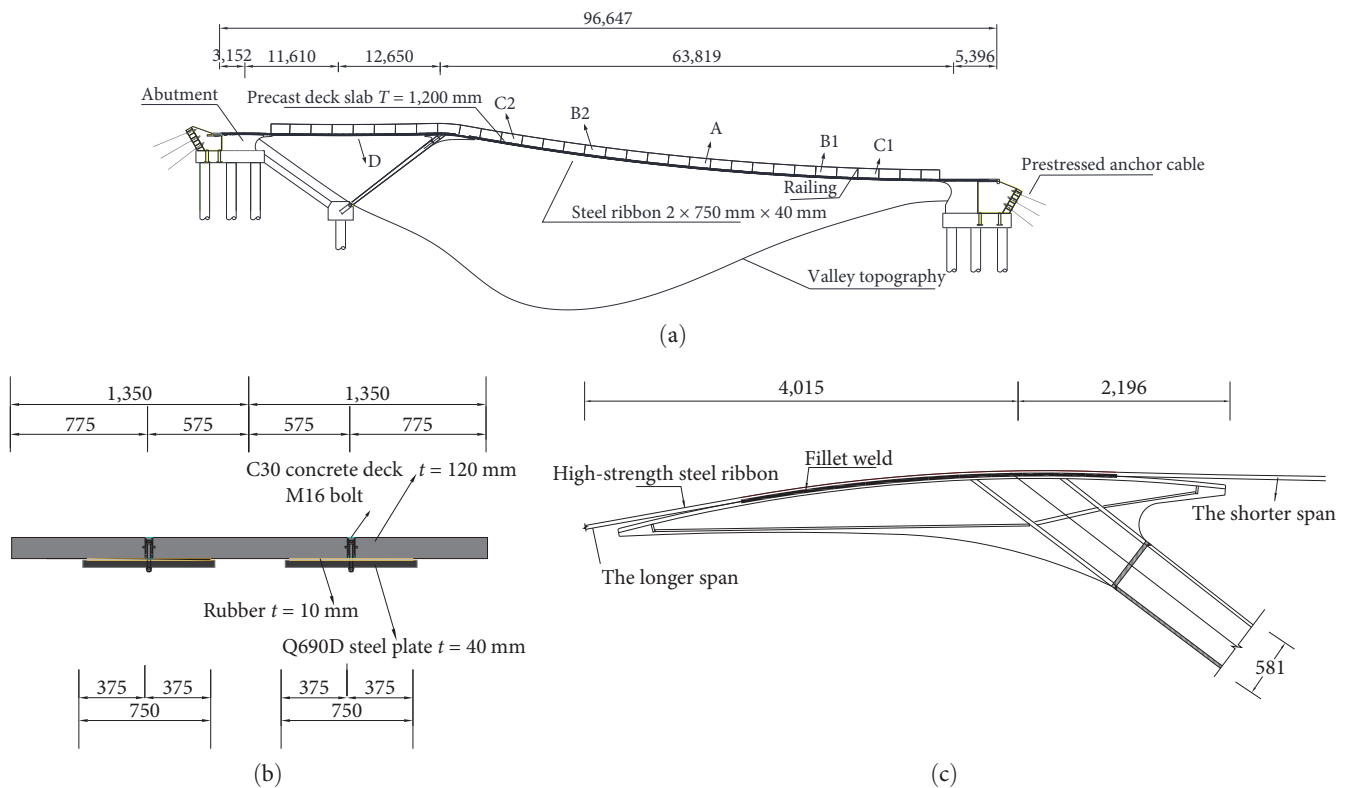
Configuration of the stress-ribbon bridge (unit: mm): (a) the elevation of the bridge; (b) section of the stress ribbon; (c) details of the saddle.
